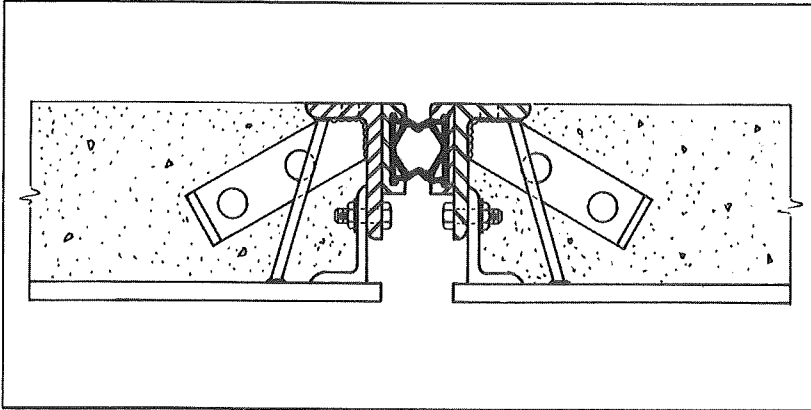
Cross-section (above) and typical installation (right) of the Type 190 Michigan Modified Wabo-Maurer seal.
